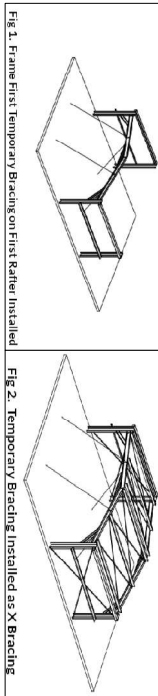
Frame First Temporary Bracing on First Rafter Installed
